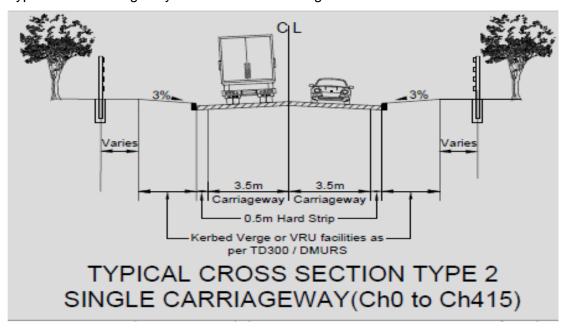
Type 2 Single Carriageway Road Cross Section
